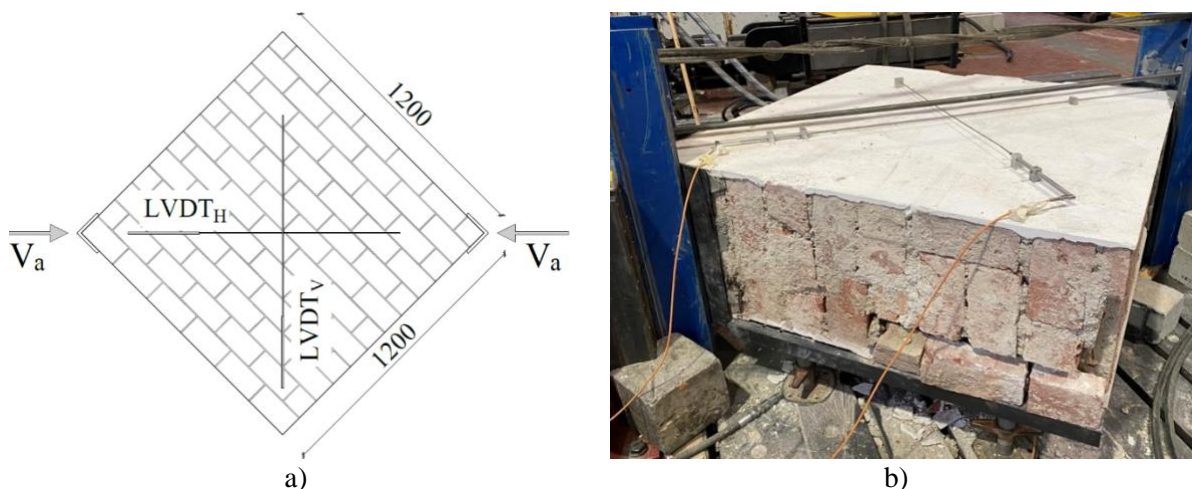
a) Sketch of the diagonal compression test set-up and b) specimen CD_NR before testing (dimensions in mm)
